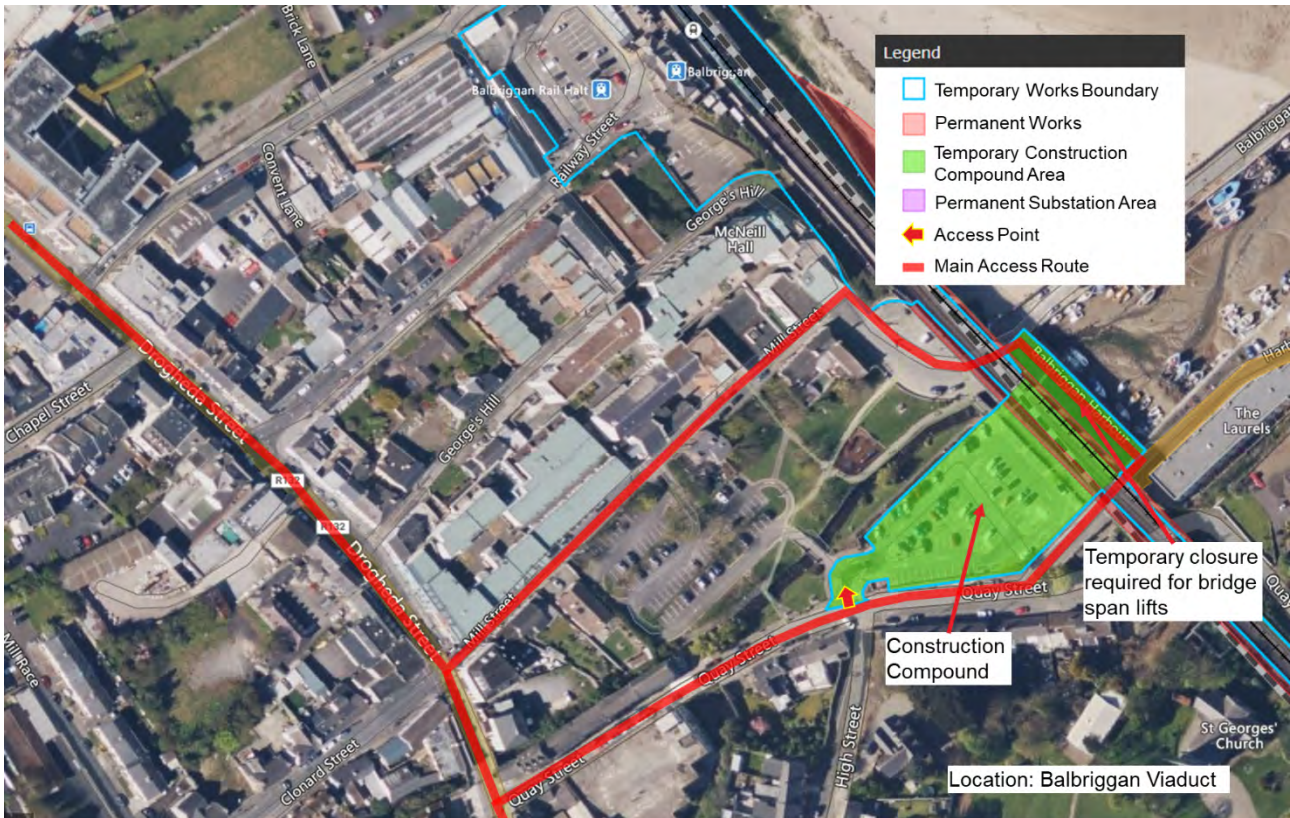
UBB56 Balbriggan Viaduct Construction Compound and Access Route
